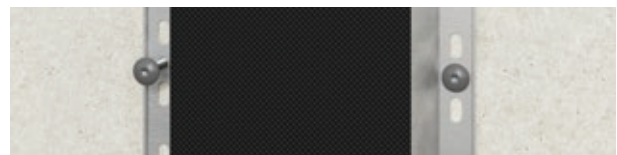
Fixing points: Swisspearl VFL profiles are installed with fastener between the elongated holes
